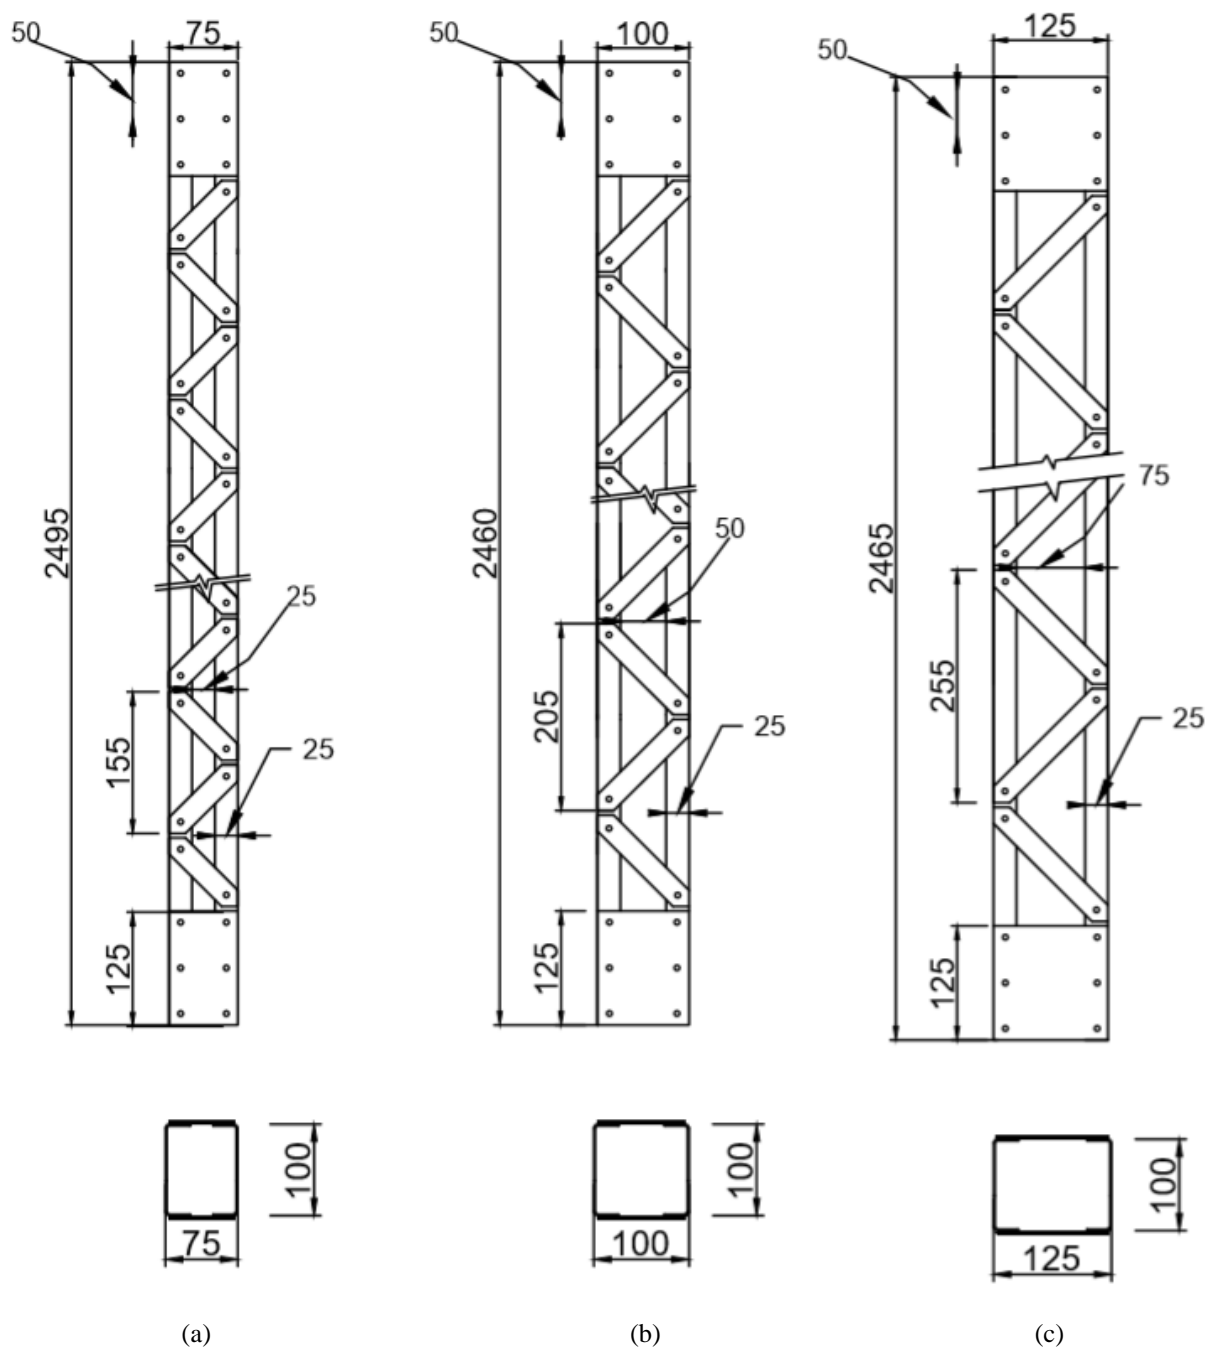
Longitudinal details of the test specimens, (a) SL-25-2.5 & SL-25-6; (b) SL-50-2.5 & SL-50-6; SL-65-4 & SL-75-6.
